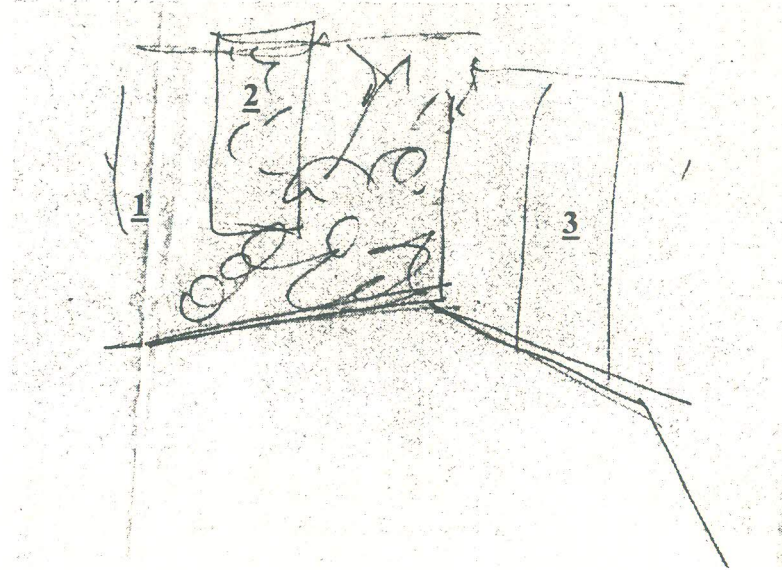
depicting the site section (Actual size 15 X 6 cm)
